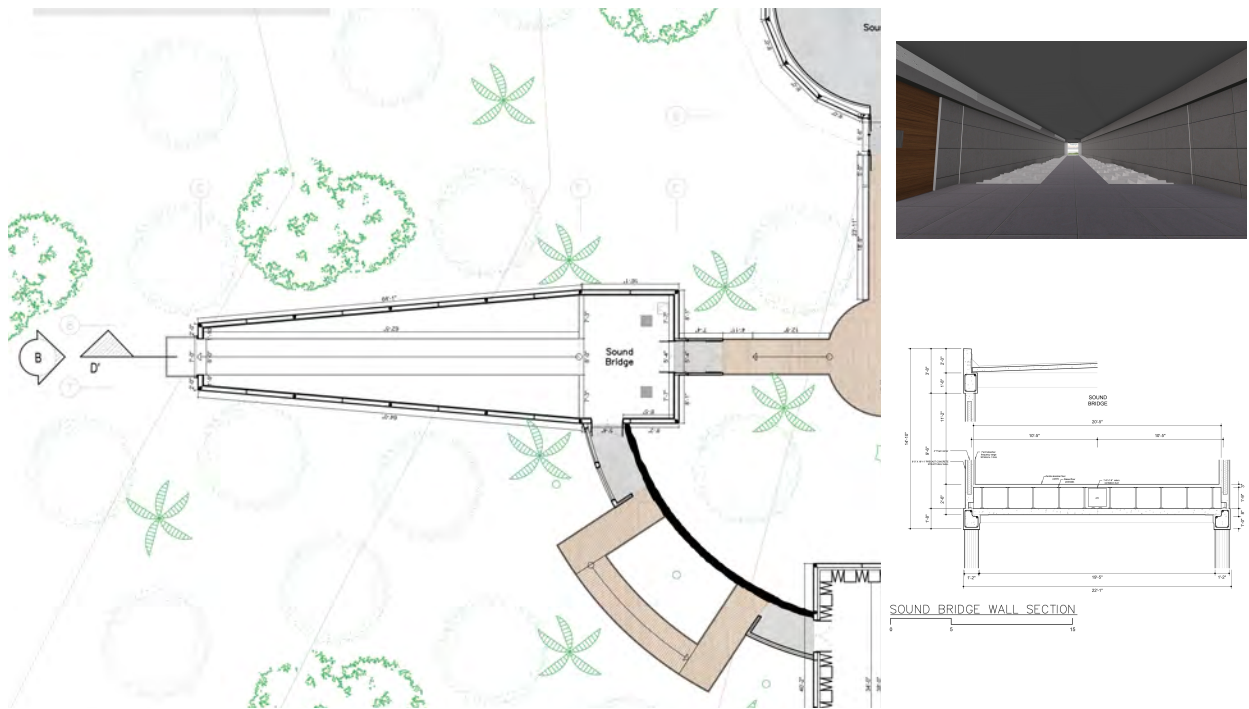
Proposed Ground Floor Plan Sound Bridge Section & Perspective. Diagram by student Reinaldo E. Hernandez Arcena.
